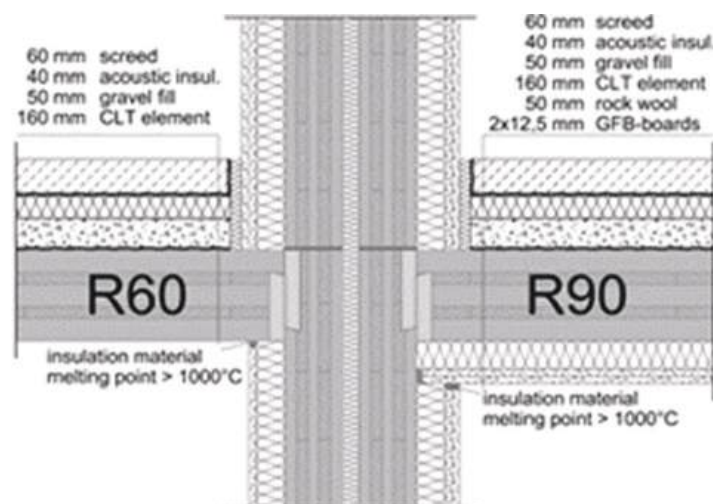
Fire protection measure - wall-side and ceiling-side with or with not facing shells
